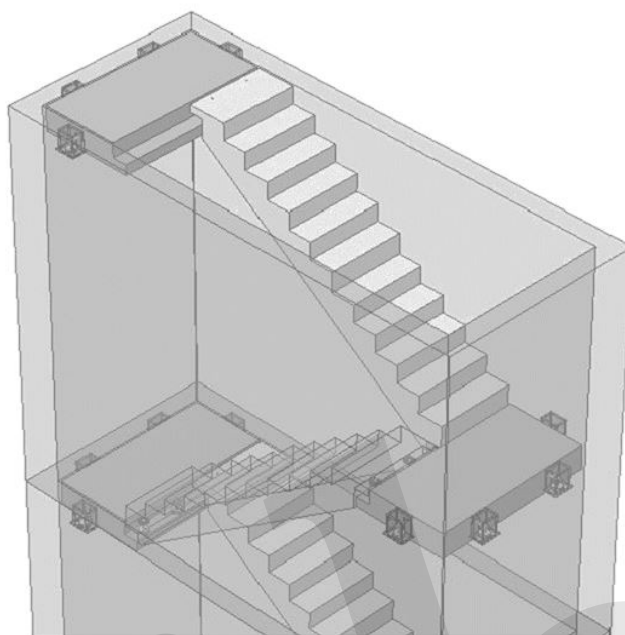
Precast stairs inside a “box” with hidden connectors, courtesy of J & P Building Systems Ltd.
